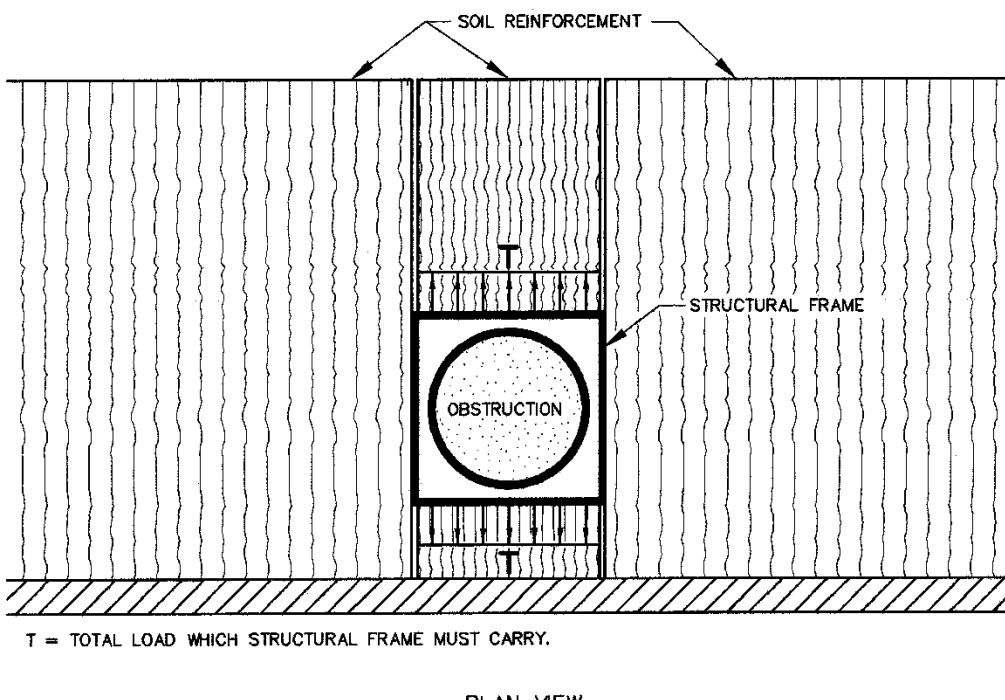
Structural Connection of Soil Reinforcement around Backfill Obstructions
